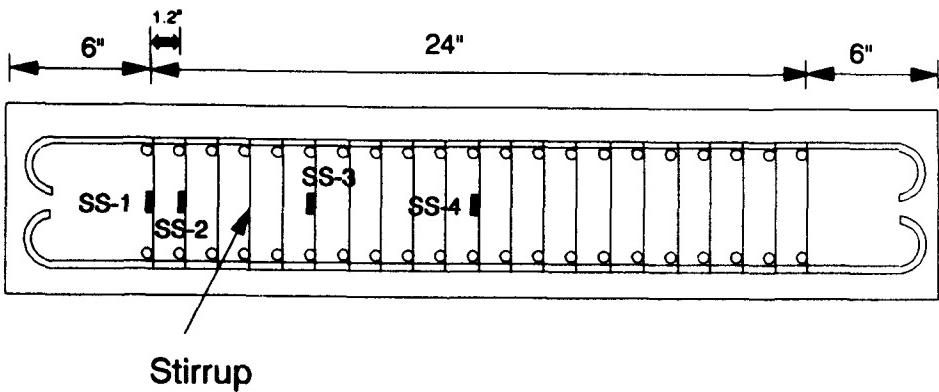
Strain Gage Locations on Stirrups in Slab Nos. 14 and 16
